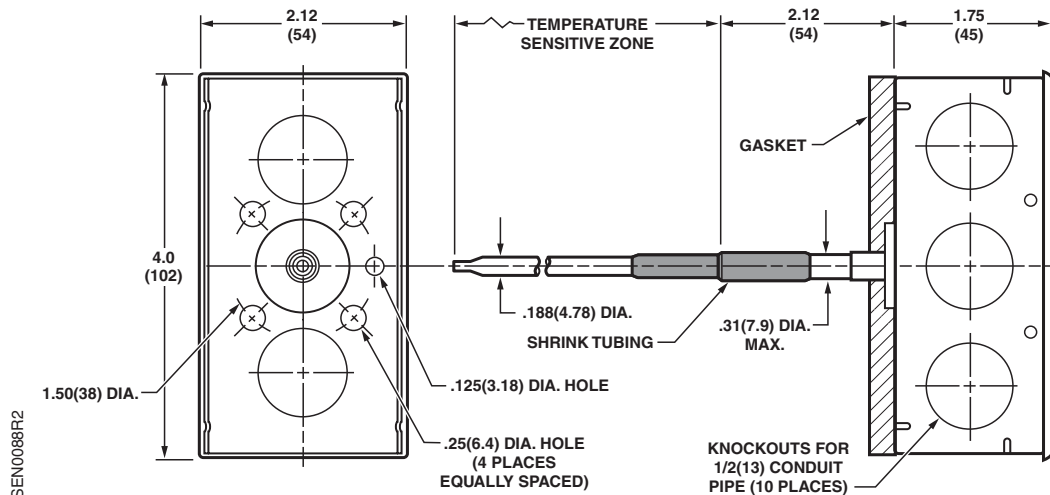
Rigid Duct Averaging Temperature Sensor Mounting Hole Locations.
